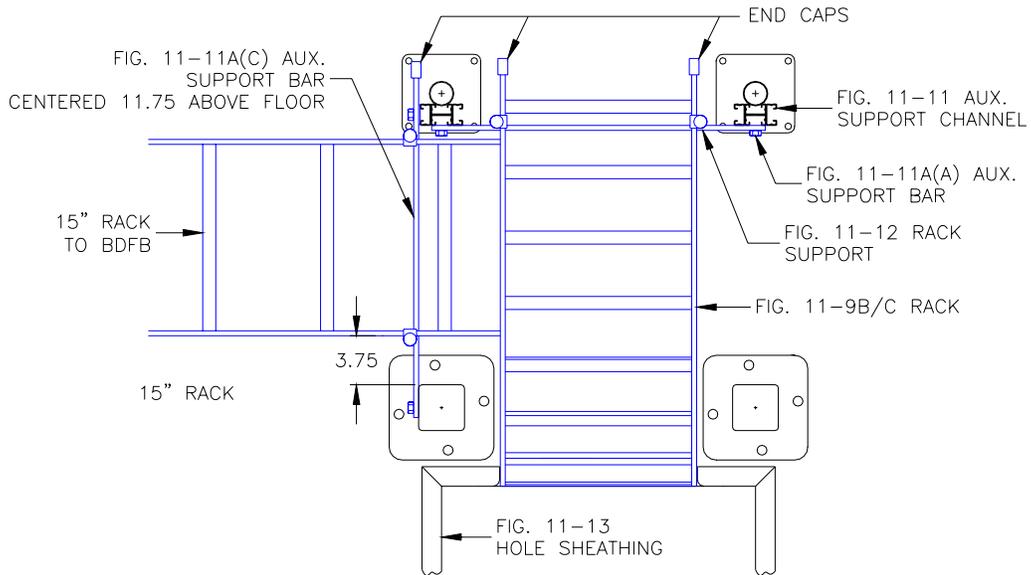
C – Power Cable Rack At cable Hole With 4" Channel Sheathing (see Fig. 11-9D)
